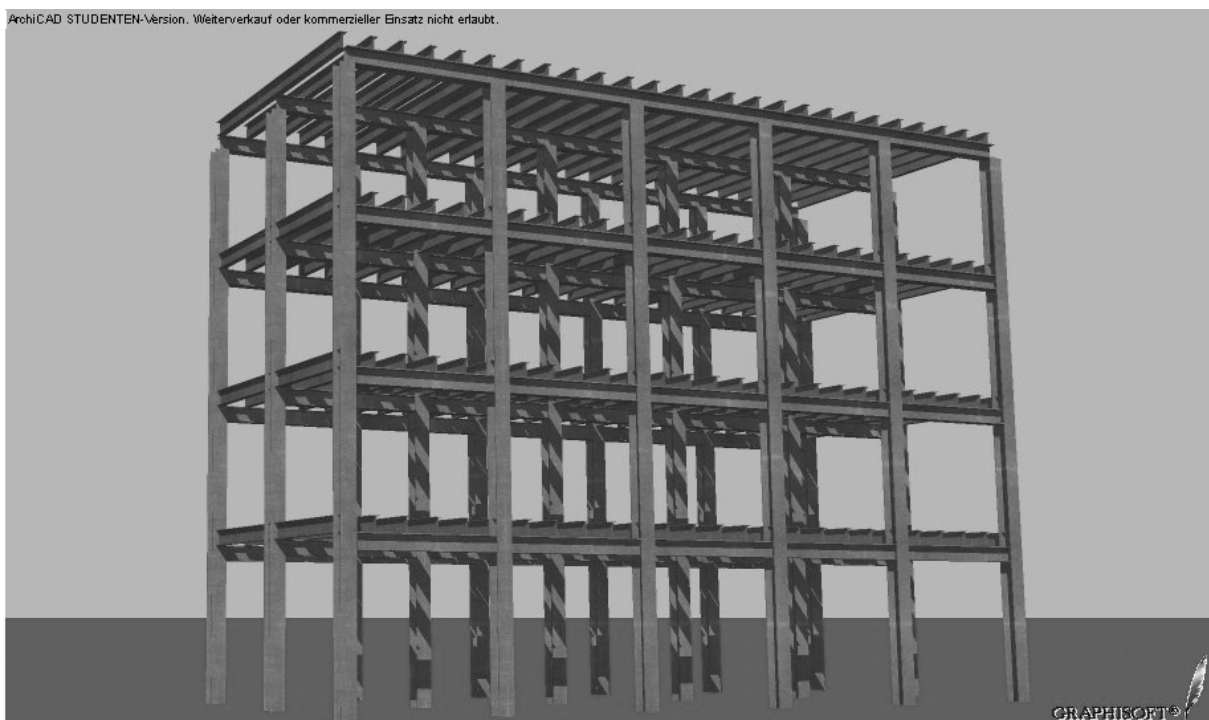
Perspective view of key load bearing elements: Variant 1 (for a structure of this type see Dammerstock Gruppe 3 by architect Otto Haesler in "Kunst und Handwerk" Heft 9. 1929. page 259)
